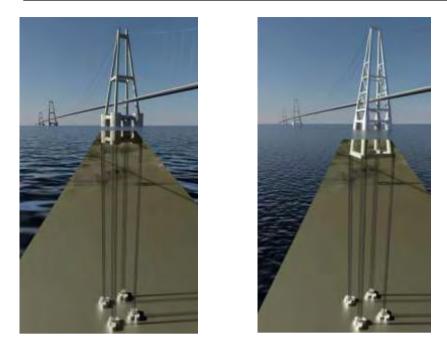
Floating bridge (TLP) across the Boknafjord (concrete and steel pontoons)
